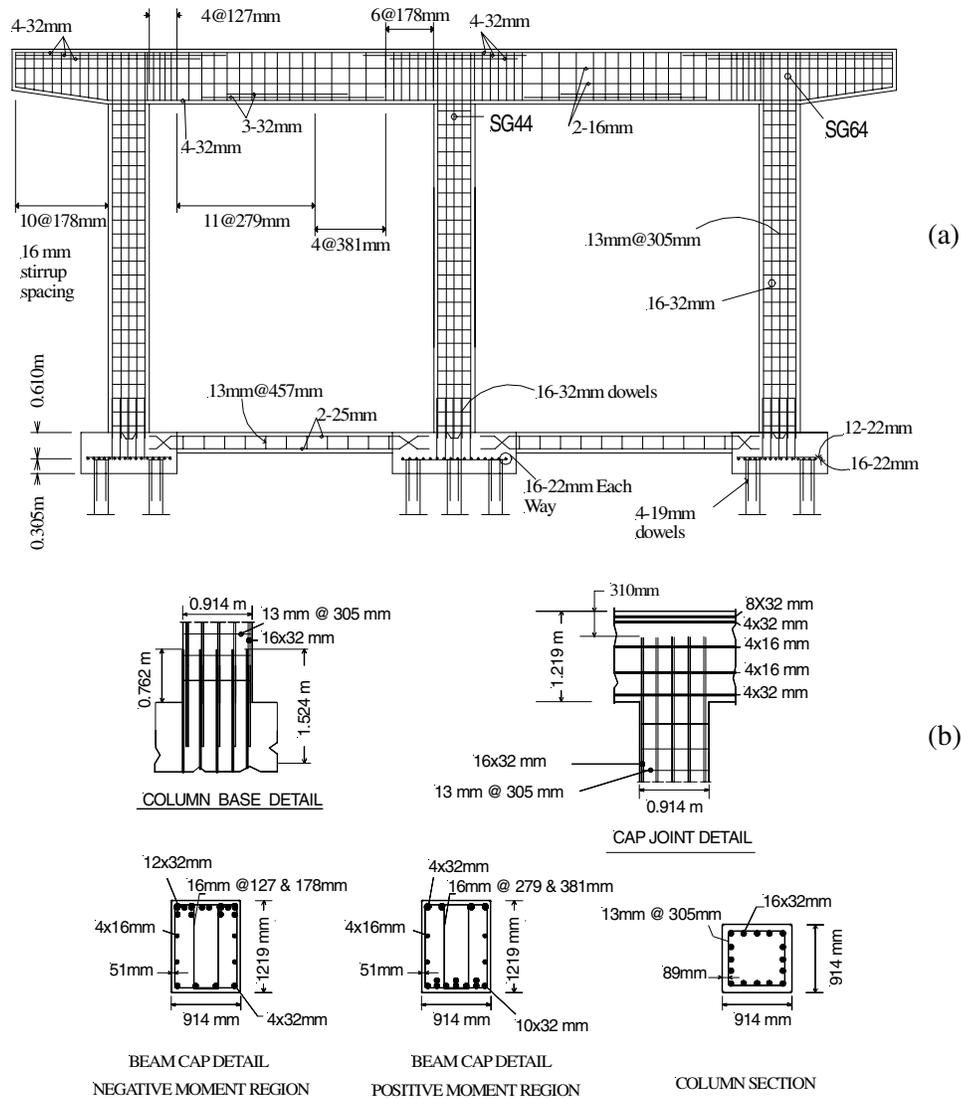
Reinforcement for the 1998 and 2000 bridge tests: (a) longitudinal, (b) cross-sections.
